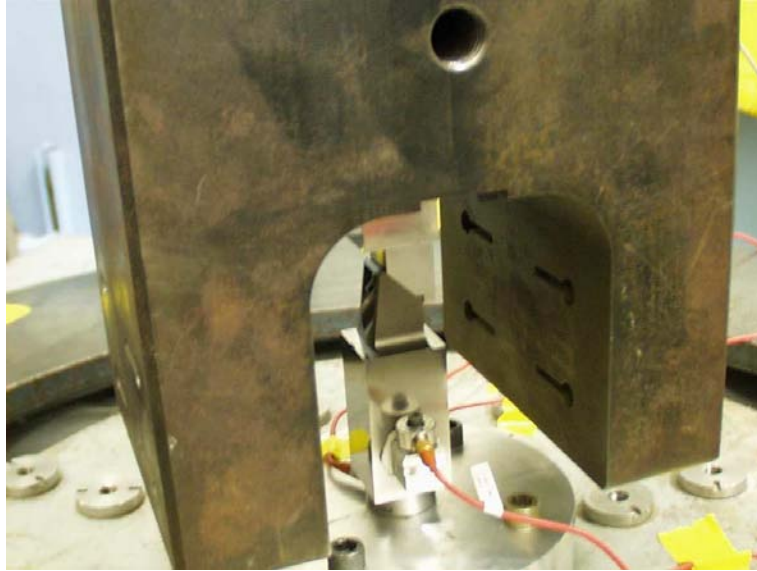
AOS Single-Leg Test Specimen with a Bolt.
